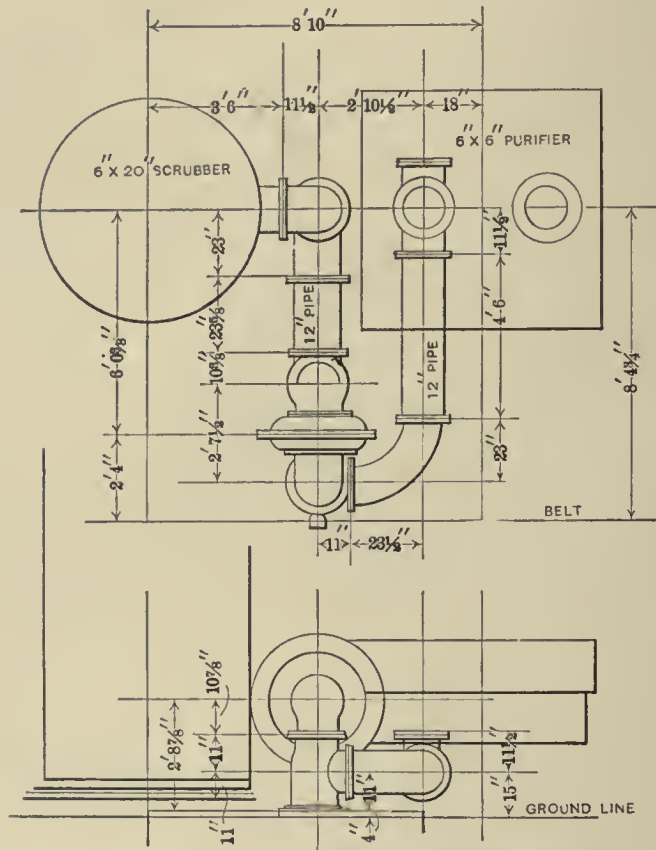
Location of Tar Separator, Plan and Elevation.
